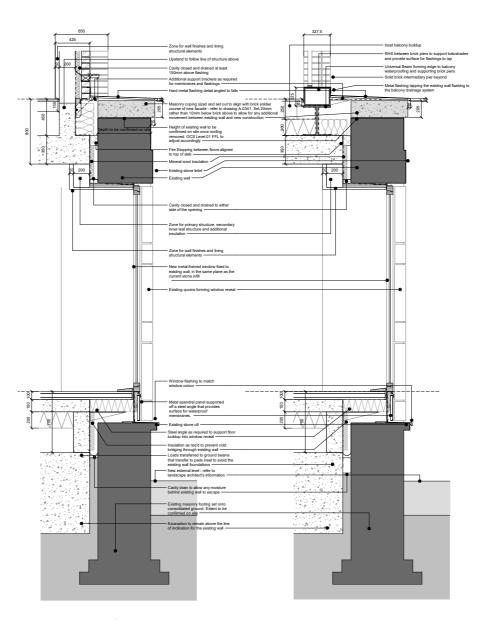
Detail of the riverside elevation, including typical opening in the existing wall. Refer to A-300 series for further details
